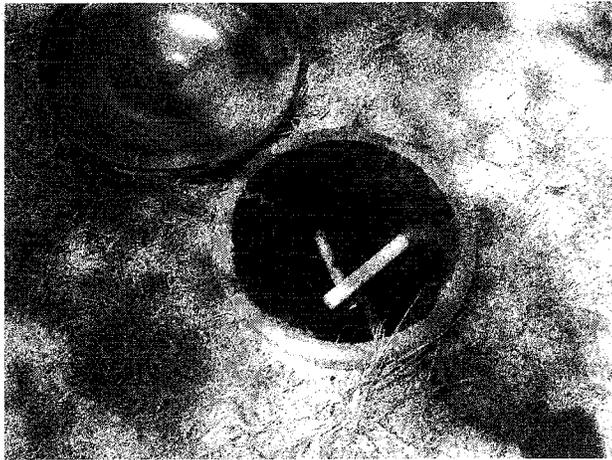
One of two landscape drainage sumps located in the raised landscaping along the south side of the site building
